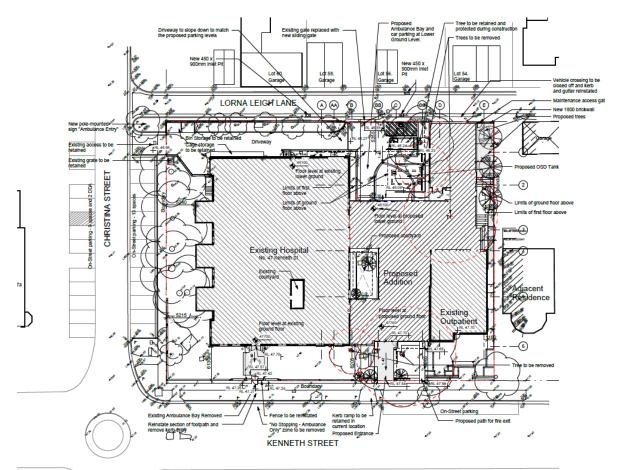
Proposed Increase in Scale of the Hospital Facility with Reduced Building Setbacks and Landscaped/Garden Setting
